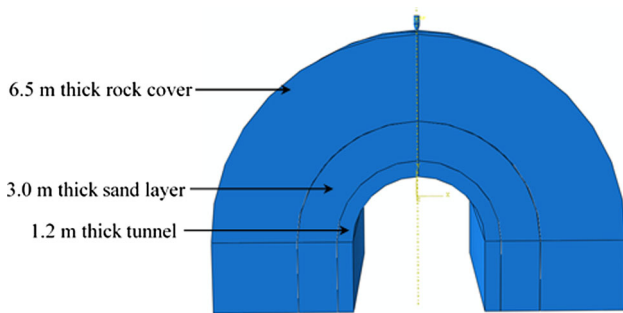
Tunnel assembly with 6.5 m thick rock cover
